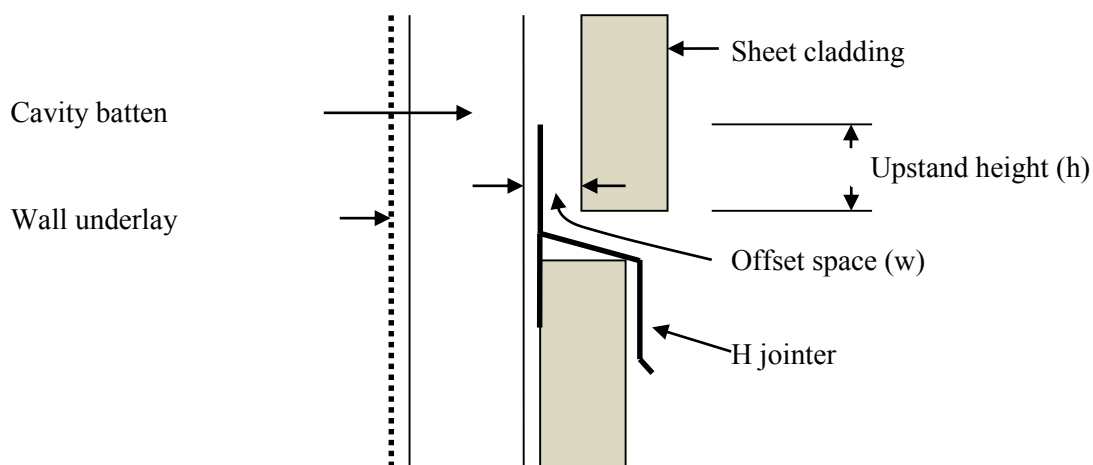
Sectional view through an H jointer between two sheets of wall cladding.
